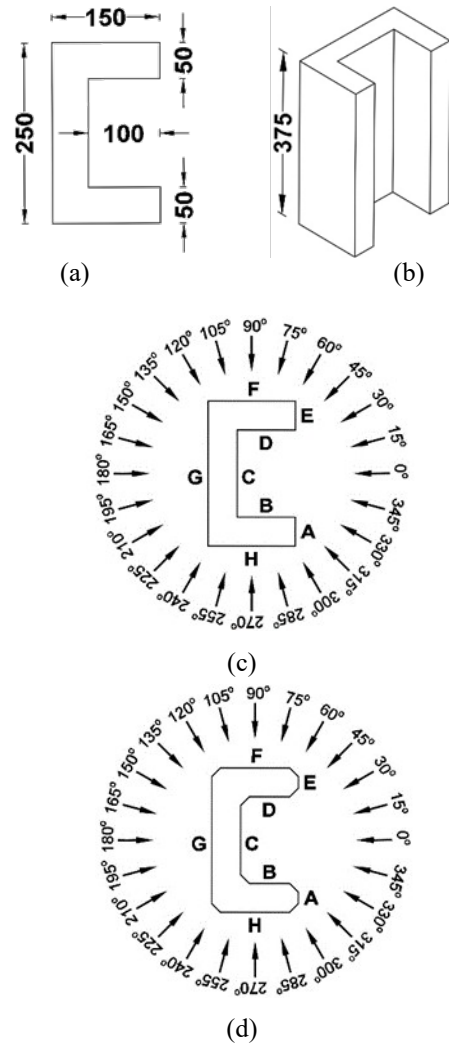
Analytical Building models (a) Plan view of Basic U shape Building (b) Elevation view of Basic U shape Building (c) Basic Building with wind angle and different face name (d) Corner chamfered building with wind angle and different face name (all dimensions are in mm)
